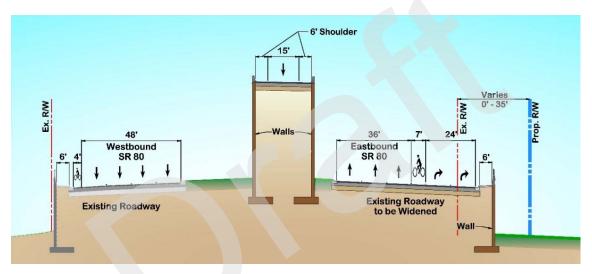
Proposed Typical Section – Alternative 3, SR 80 West of I-95
